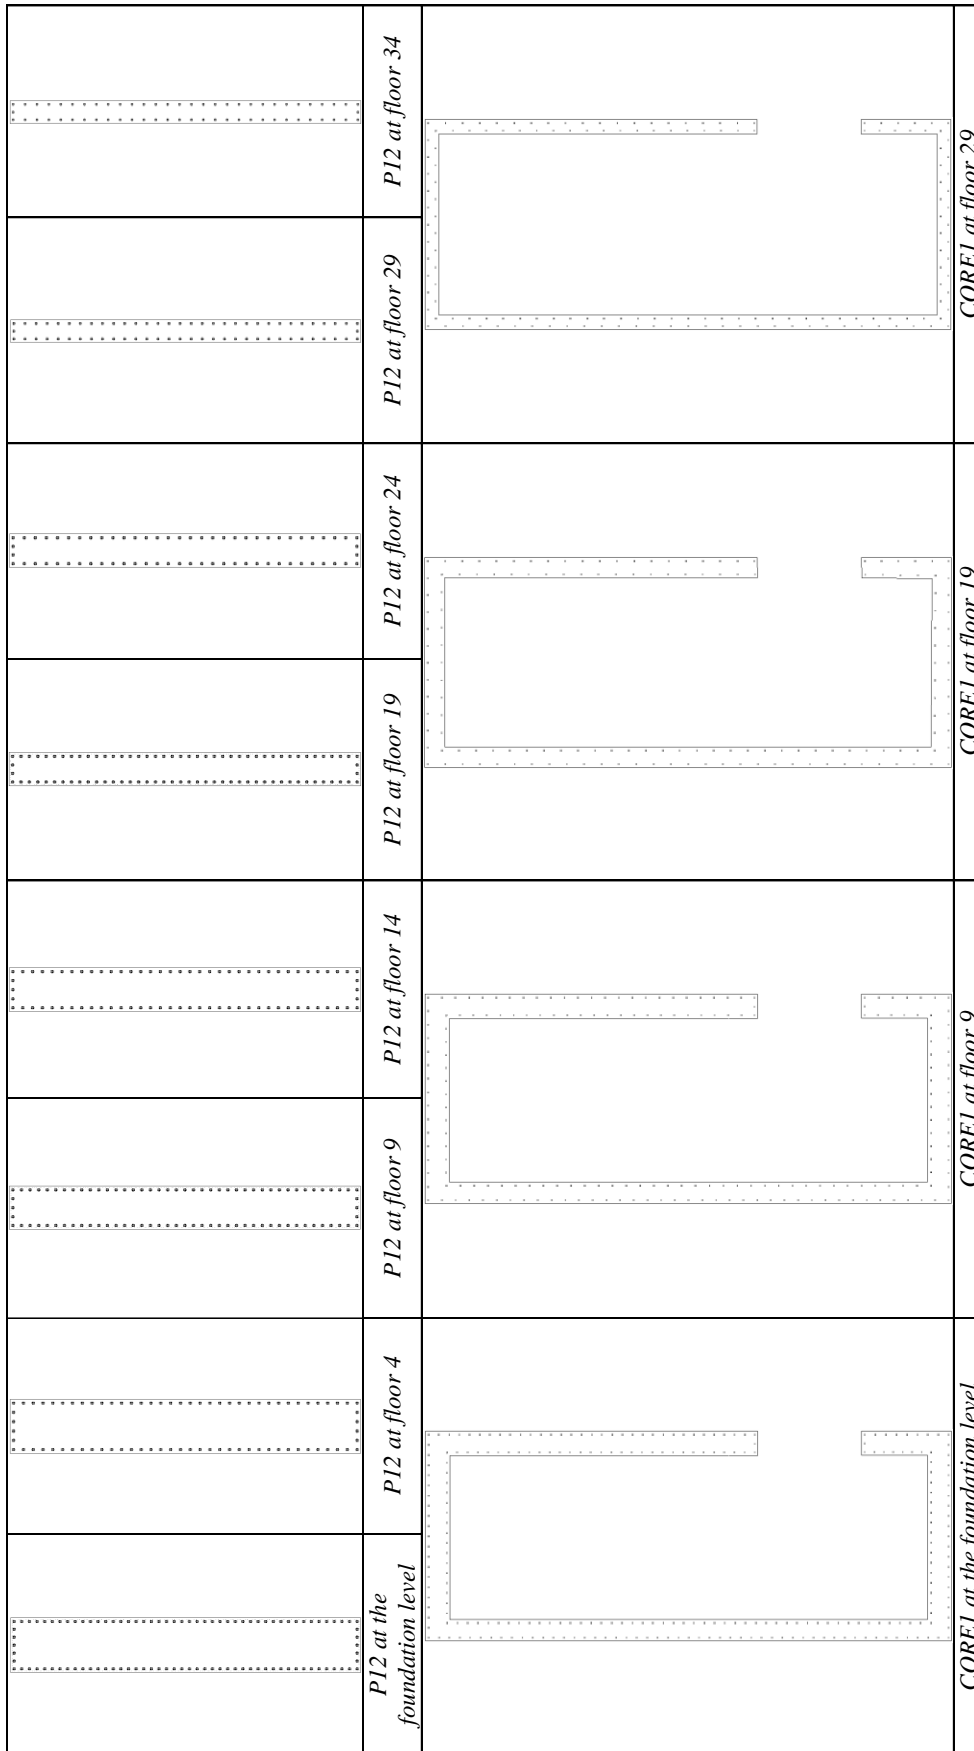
RC cross-sections used in the design of the 40-story building.
